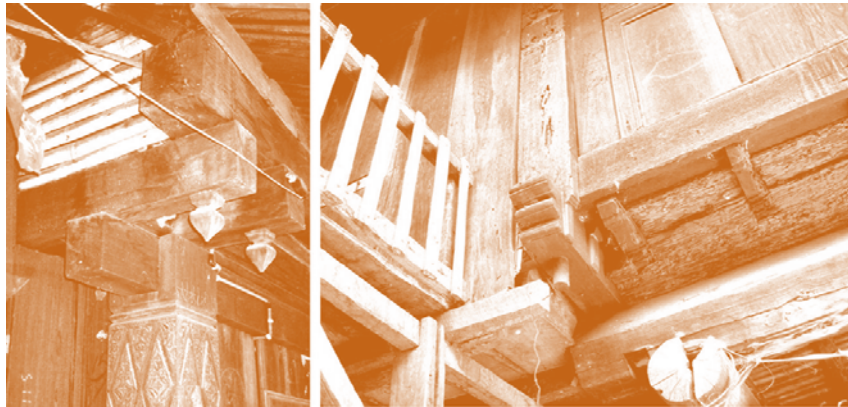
Fundamental timber construction of press, pivot, pinch and pull.
